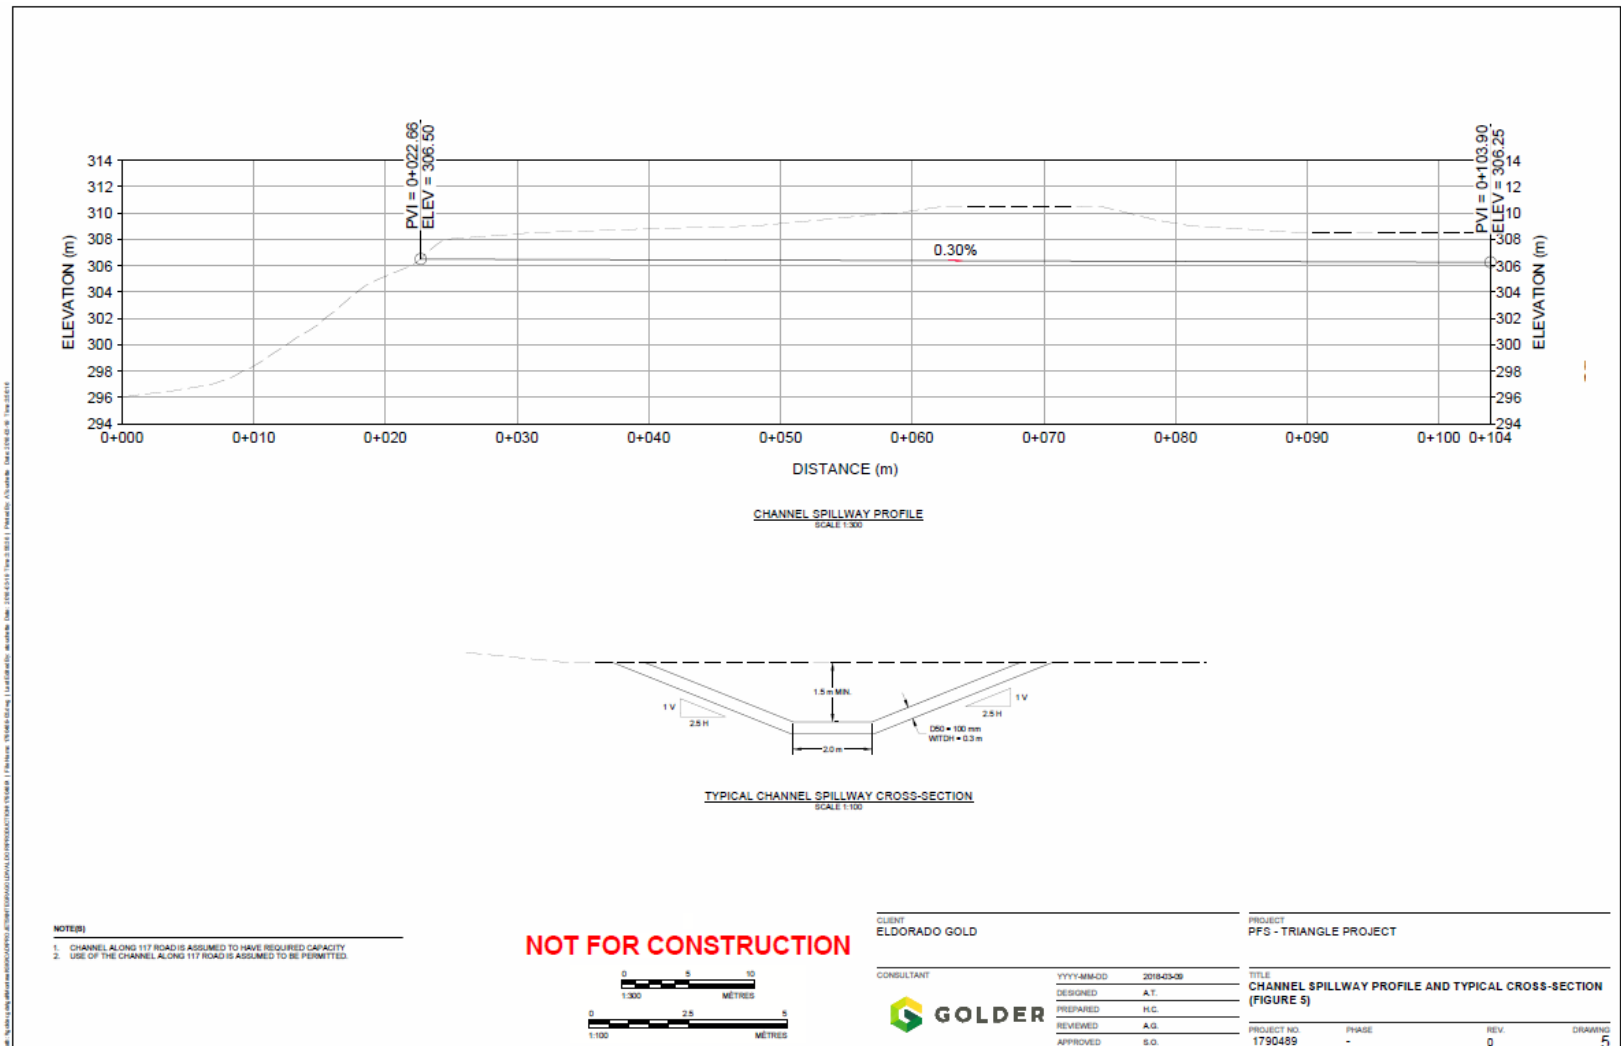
Channel Spillway Profile and Typical Cross-Section
